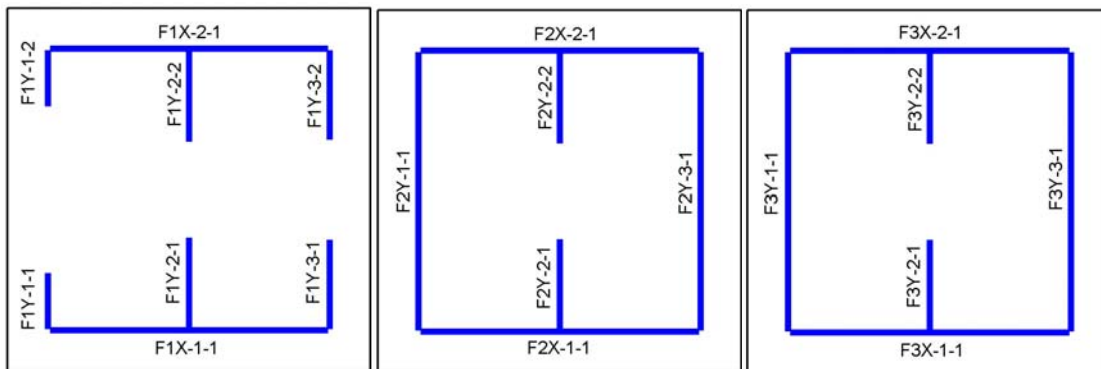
Wall IDs of structure for first (left), second (middle) and third (right) floor
